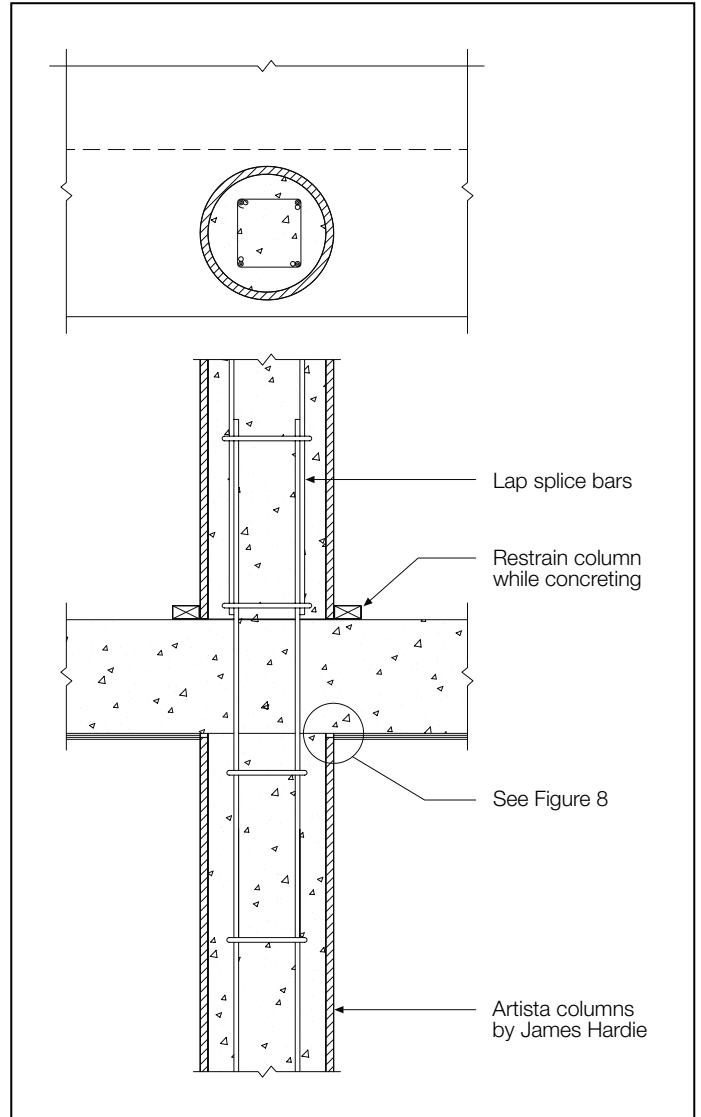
COLUMN CONTINUES ABOVE FLOOR
